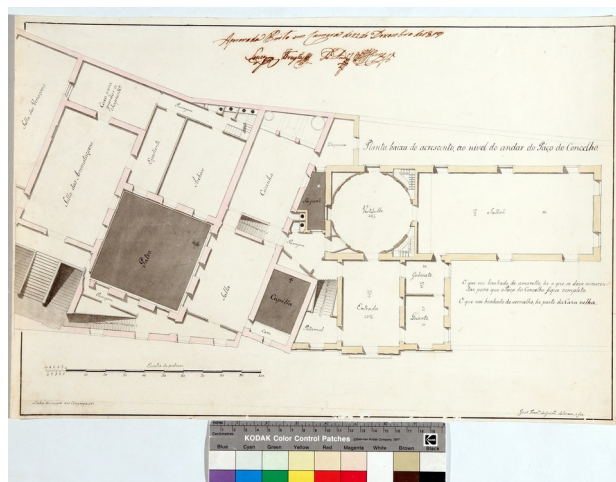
Plan for the first floor of the building in Rua dos Reis Magos
